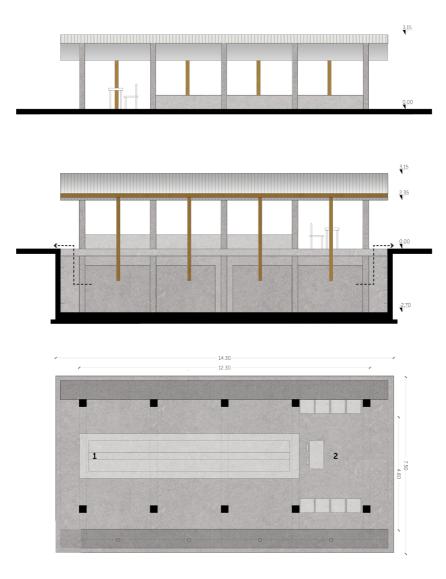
, 57, 58 – Wash-houses module. From the top: longitudinal elevation and section; floor-plan.
